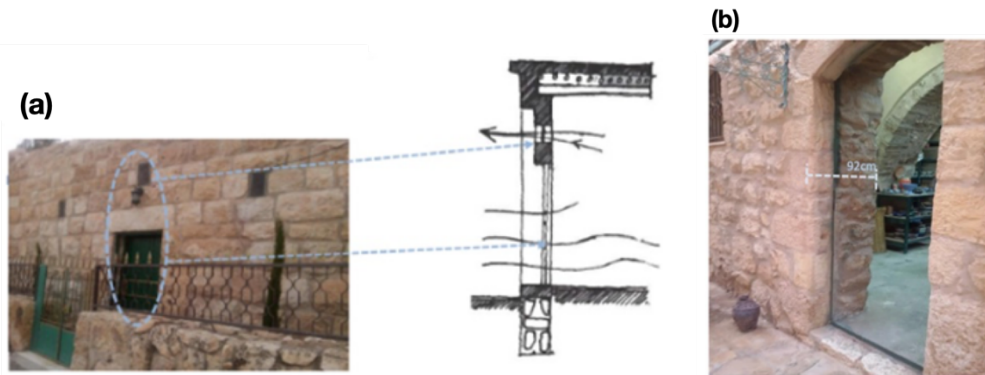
(a) The small vents above the door level to allow natural ventilation, (b) the massive thickness of external walls in the vernacular building.
